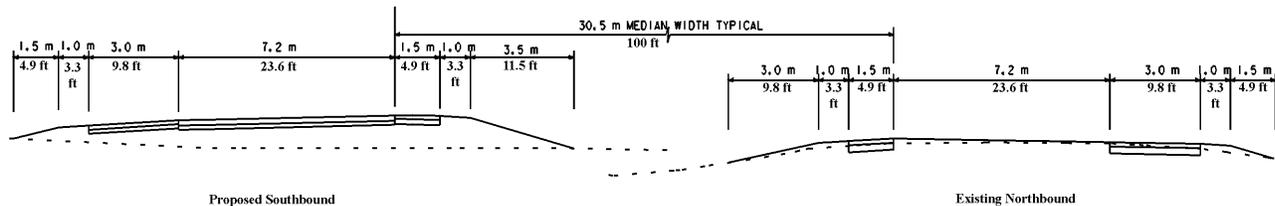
Proposed Typical Cross-Section: Alternative 1
